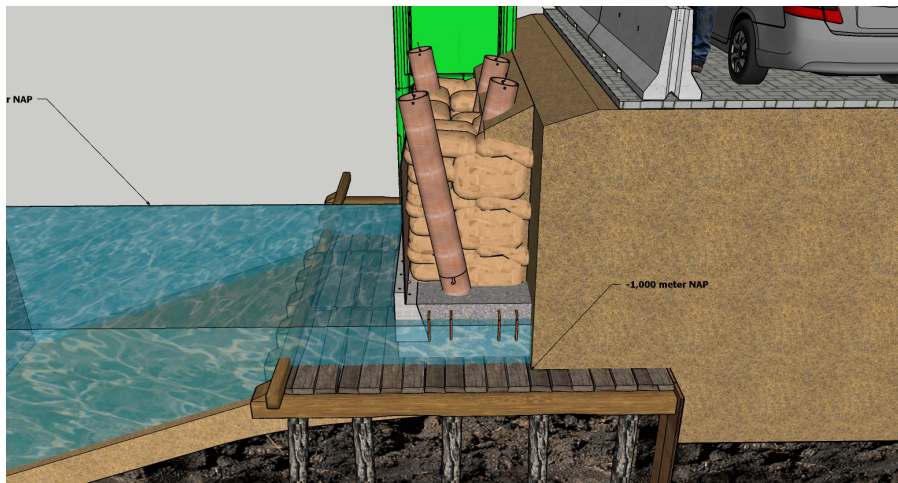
When the trench box is removed, the sand bags act as a retaining wall. [36]
